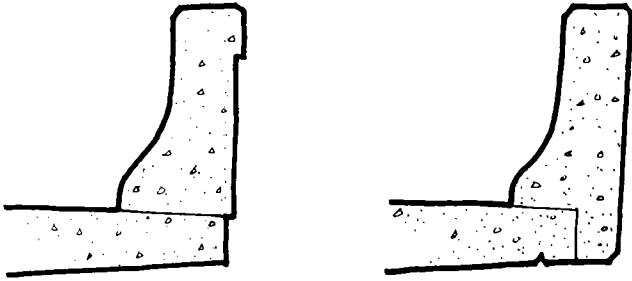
Textures and shapes on the bridge barrier face will affect the appearance of the bridge. Also, note the drip groove on the bottom of the deck slab.
